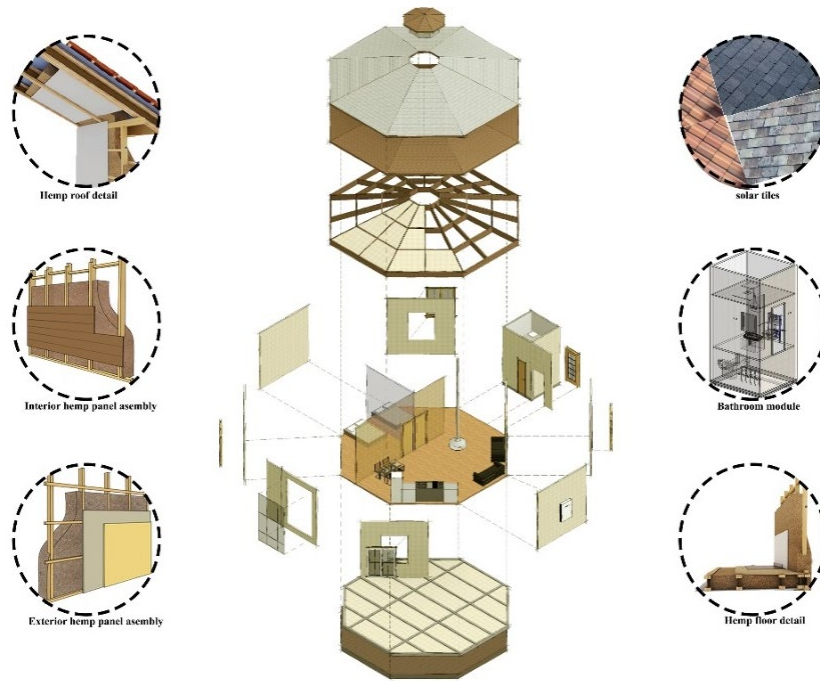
Details of Prefabricated Modules in Hogan Style House (Hempitecture2020)
